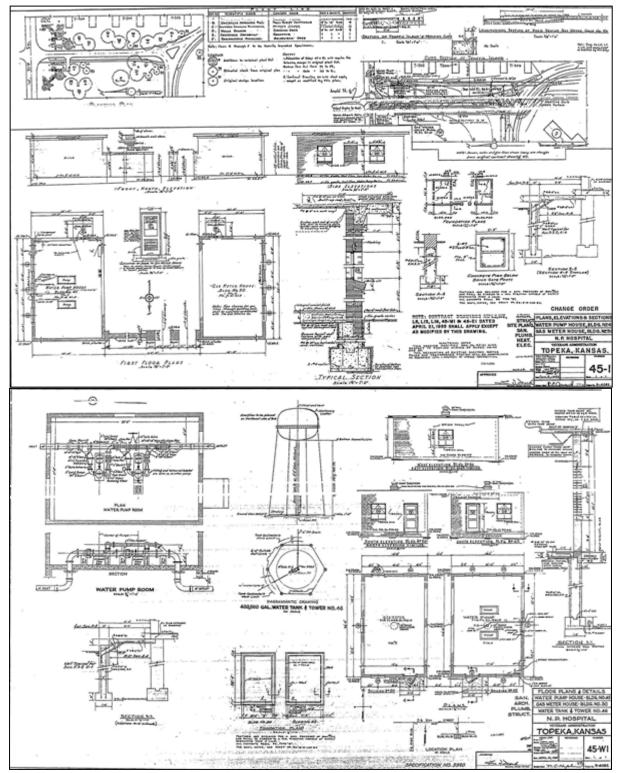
Architectural drawings for Building Nos. 45 and 50 showing their location and the plan, elevation, and section of each and the water tower (No. 46), 1955 (VA).
